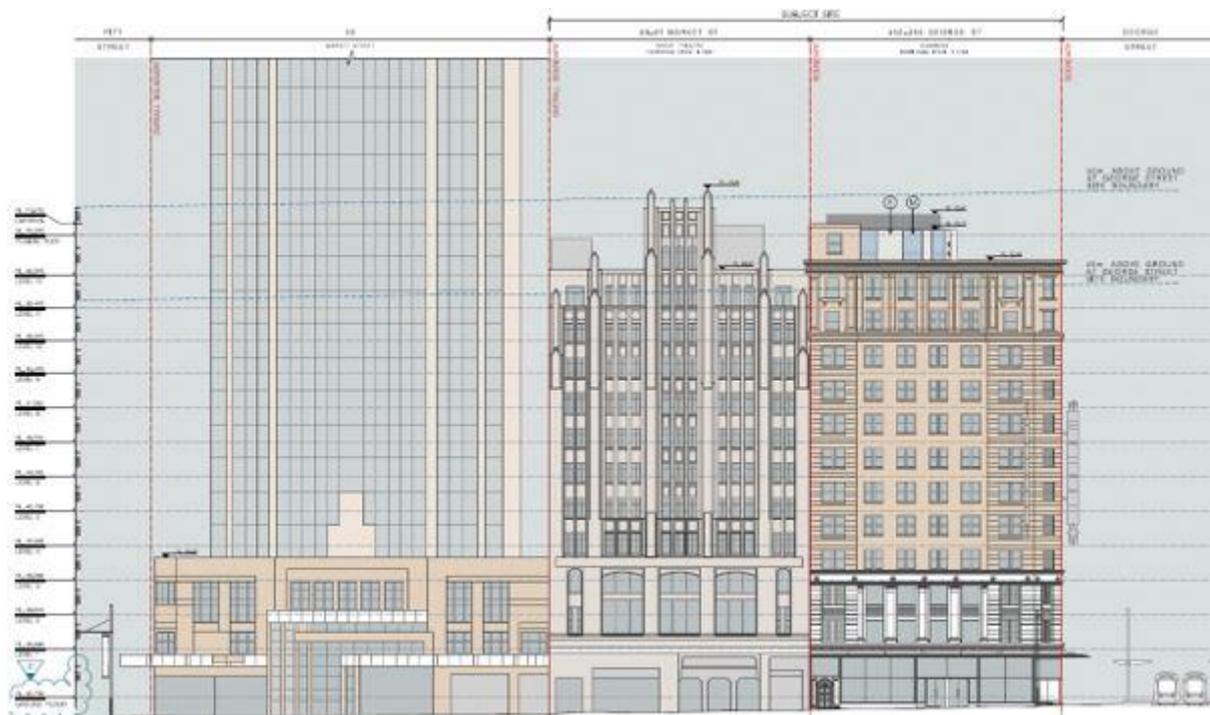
Market Street (north) elevation, noting that the only new works visible in this elevation is the rooftop addition, setback approximately 3.5 metres from Market Street
